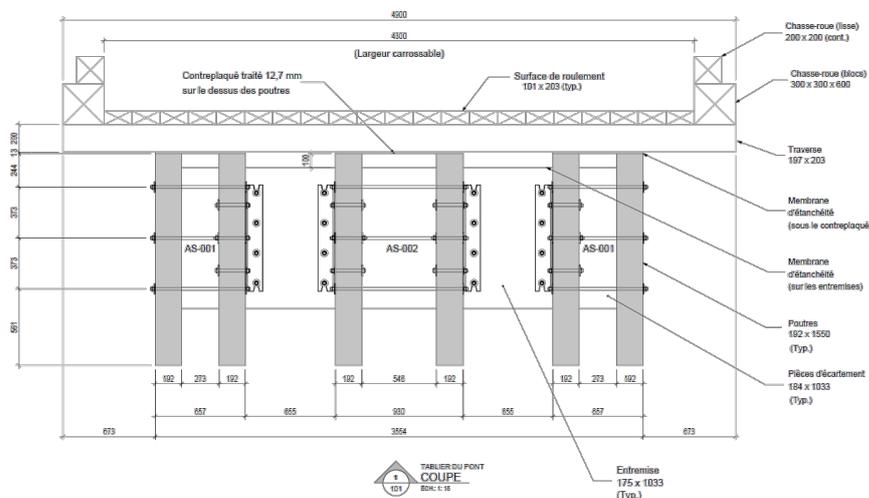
Concept with pre-assembled glulam girders (credit: Nordic Structures)
